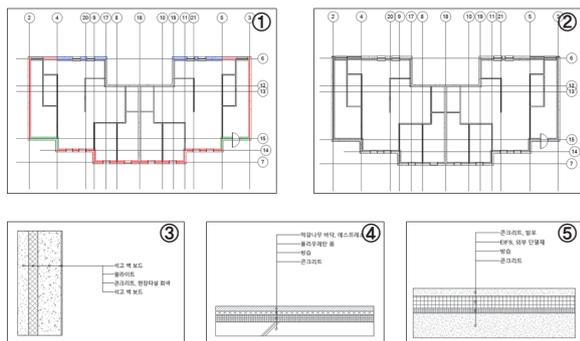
Required Drawings – ① Plan View for Insulation Plan ② Plan View ③ Section view of wall ④ Section View of floor ⑤ Section view of roof
